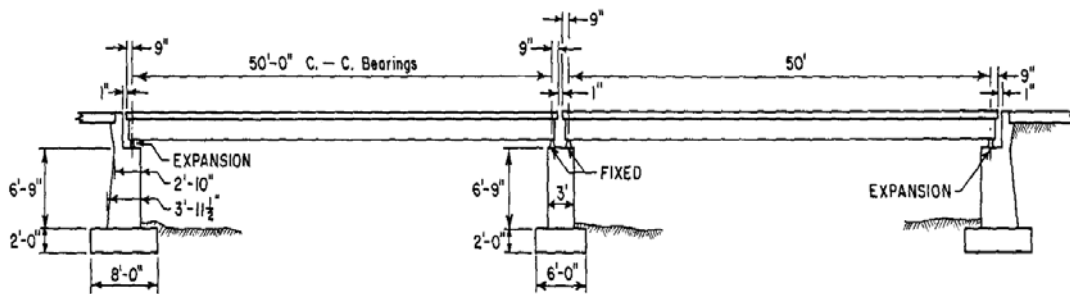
Longitudinal View of Typical Road Test Bridge (AASHO 1962)
